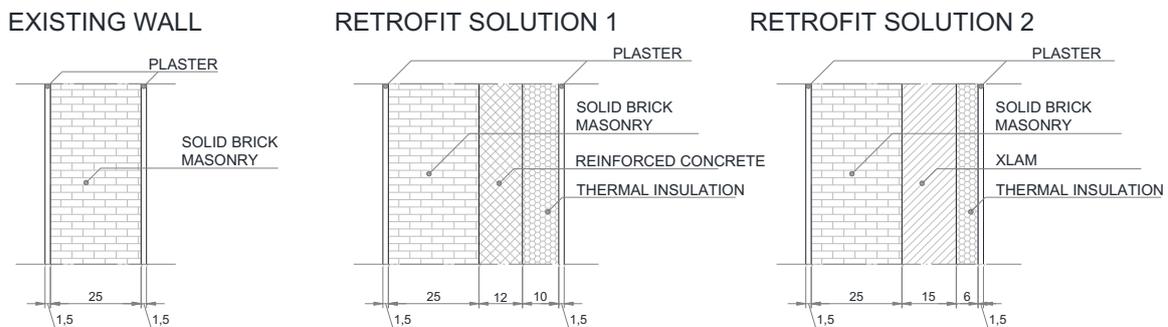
Stratigraphy of the existing wall and the retrofit interventions proposed.
